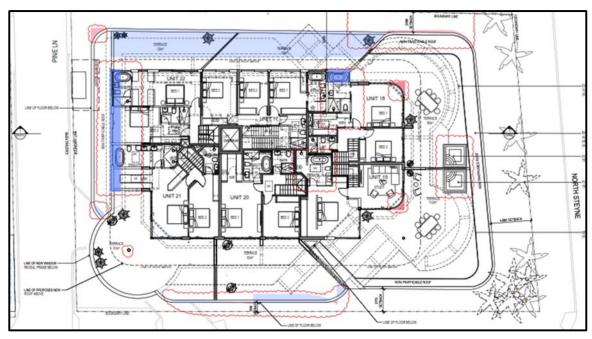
s4.55 Level 3 Floor Plan; Squillace Issue B, August 2021
